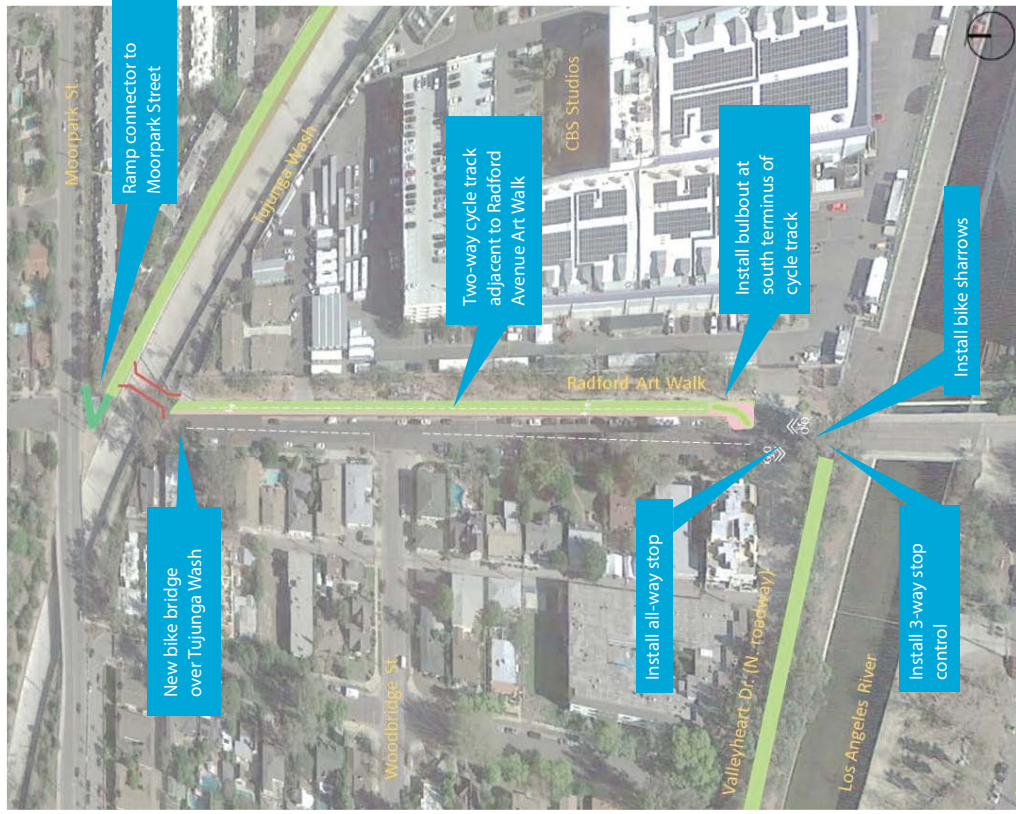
At-Grade Concept Plan for Radford Avenue
